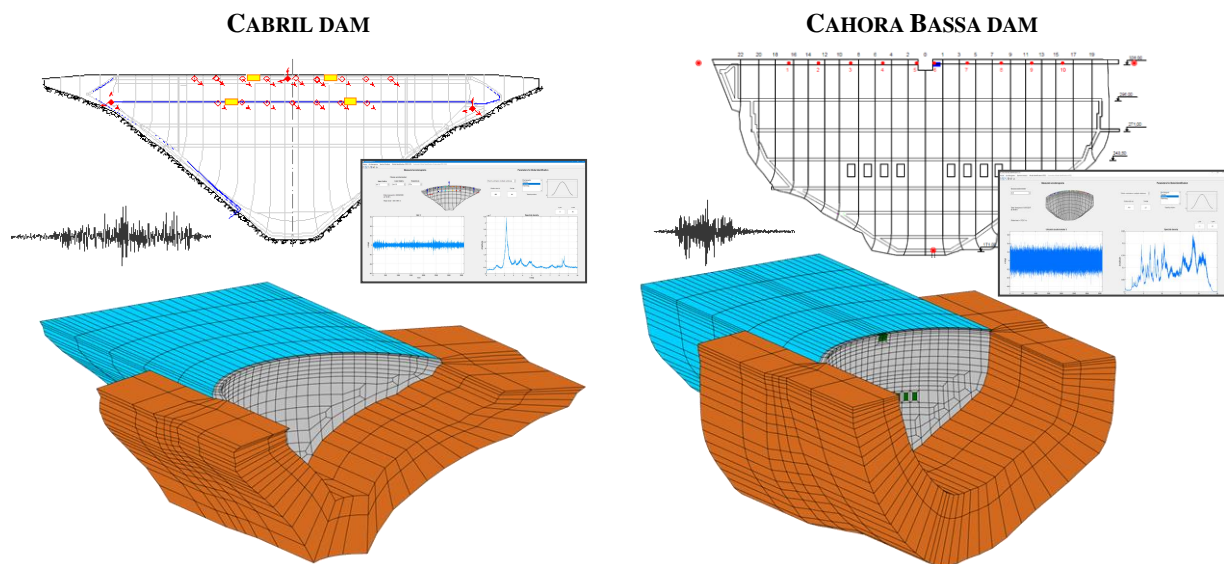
Cabril dam and Cahora Bassa dam. SSHM systems and examples of 3D finite element models of the dam-reservoir-foundation systems.
